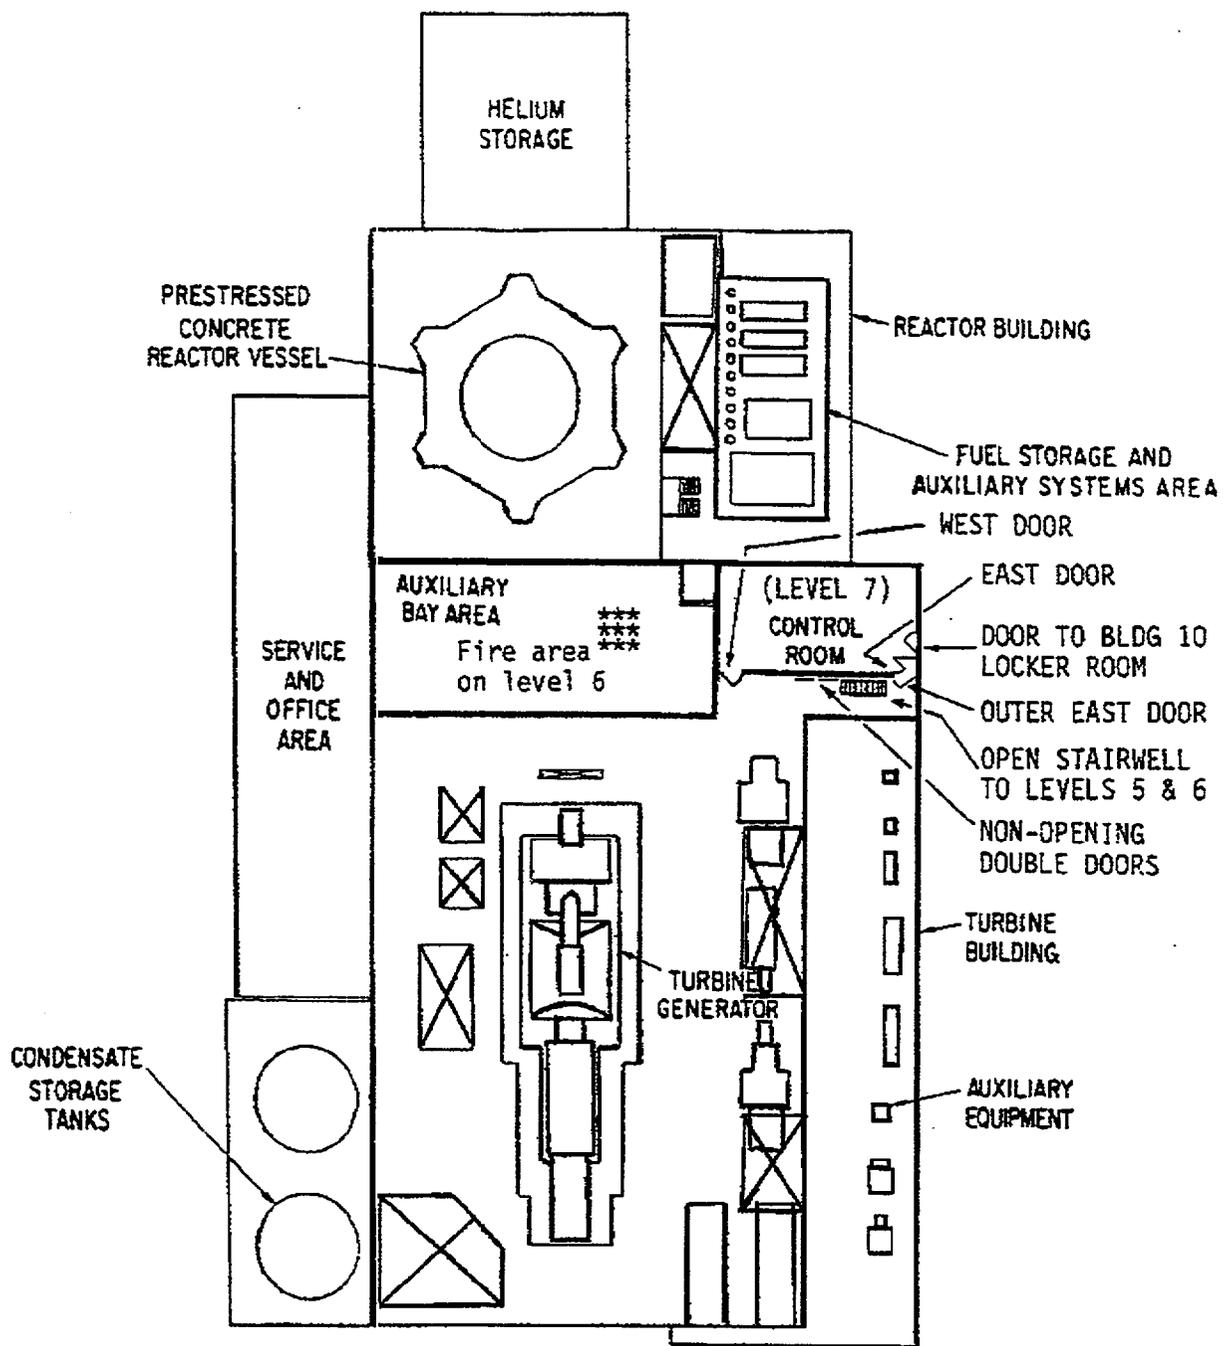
Plan view of the reactor building and turbine building including fire area on Level 6 and control room on level 7 (from Reference A14-1).
